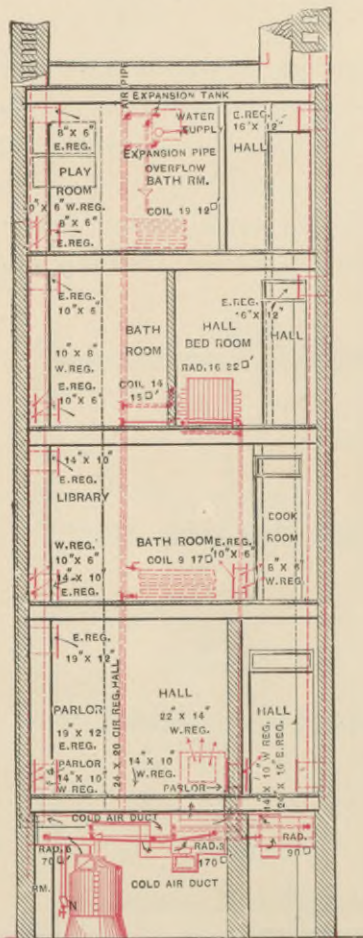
Sectional Transverse Elevation of City Residence. Scale  $\frac{1}{2}$  inch to the foot.
